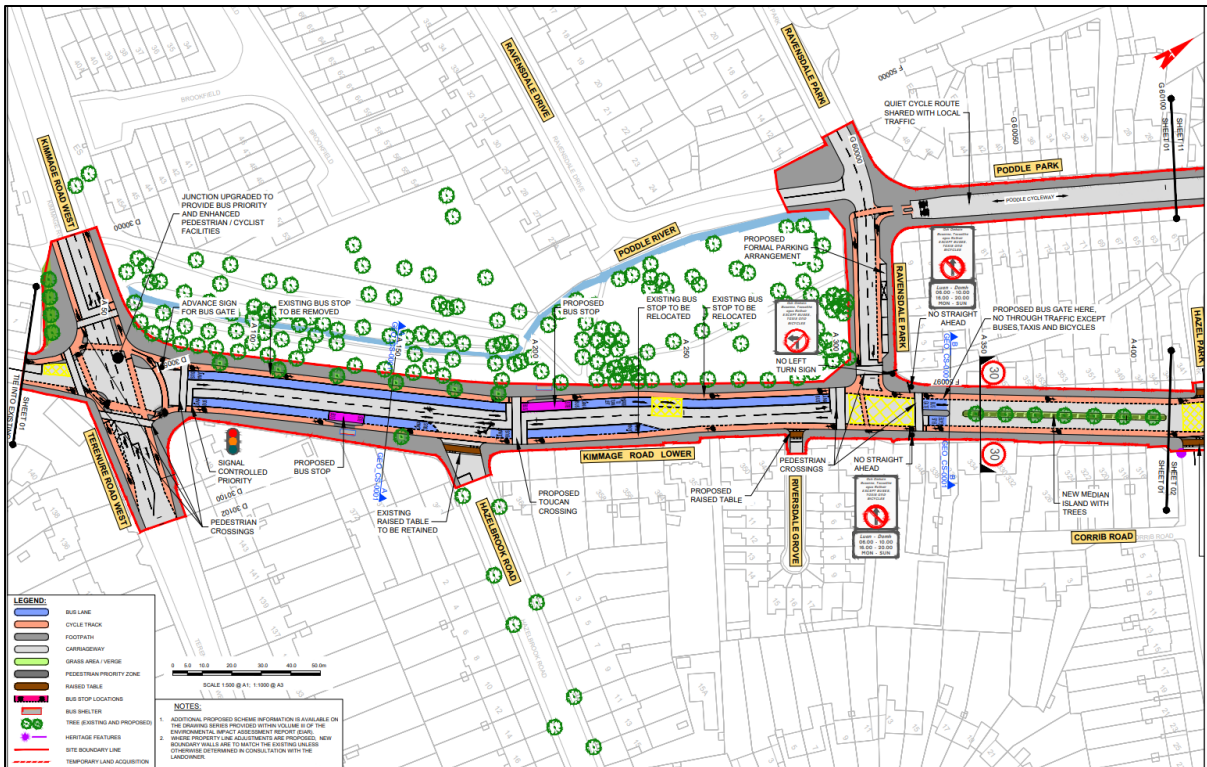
Extract from General Arrangement Drawings (Sheet 1)
